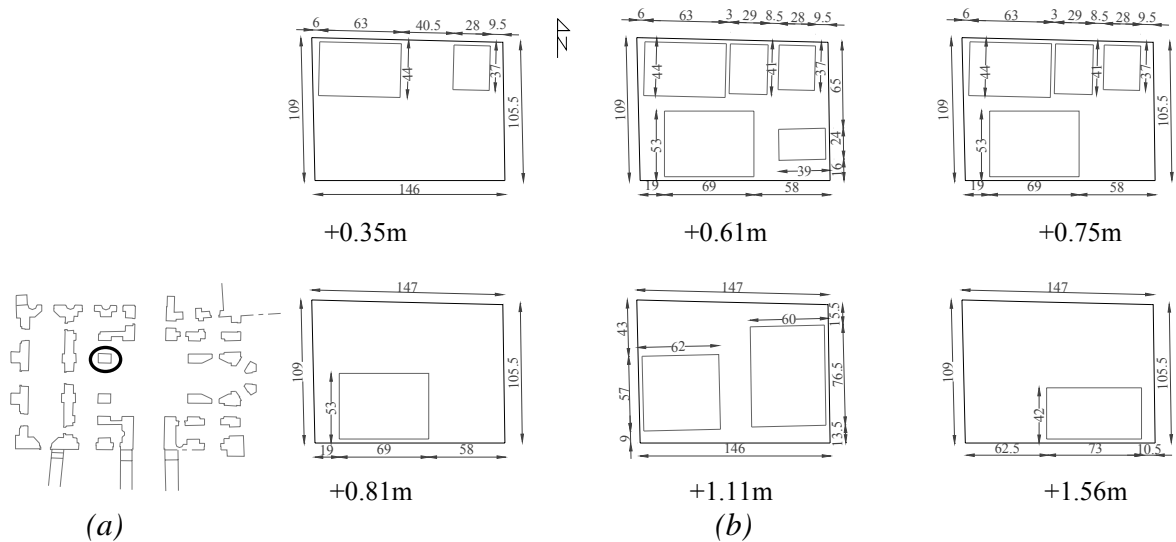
(a) Position of the pier I34 in plan, (b) Horizontal sections of the pier I34 (Ground floor), at various heights measured from the ground level.
